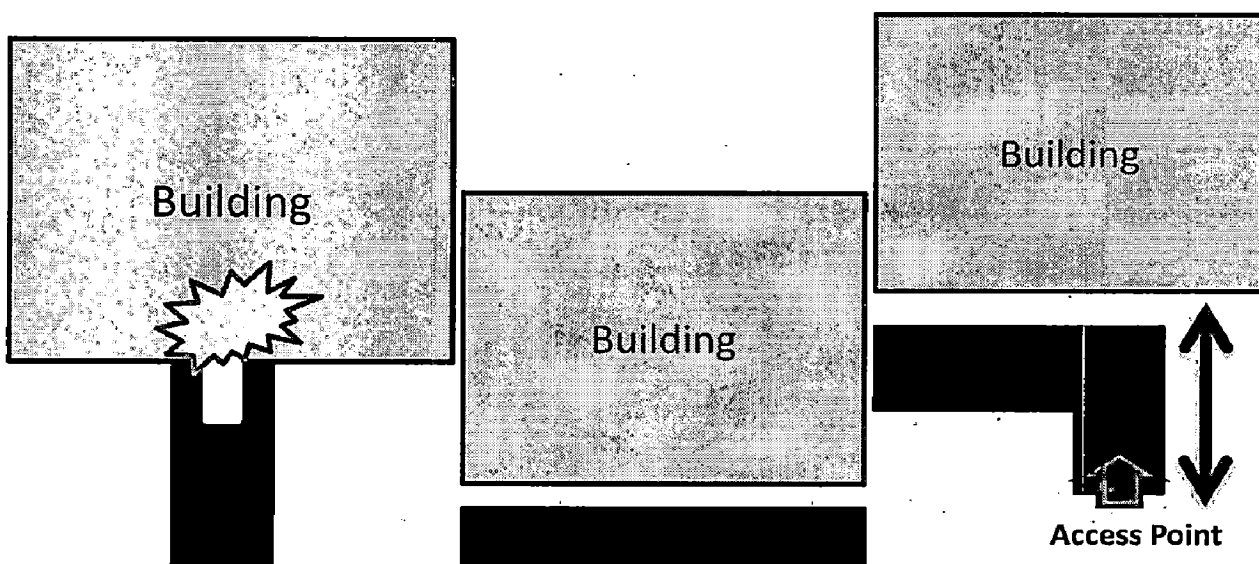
Access road should not be straight to the building instead it should be made parallel to the building. If it's not possible, the road must take a bend to prevent the vehicle from gaining speed.
